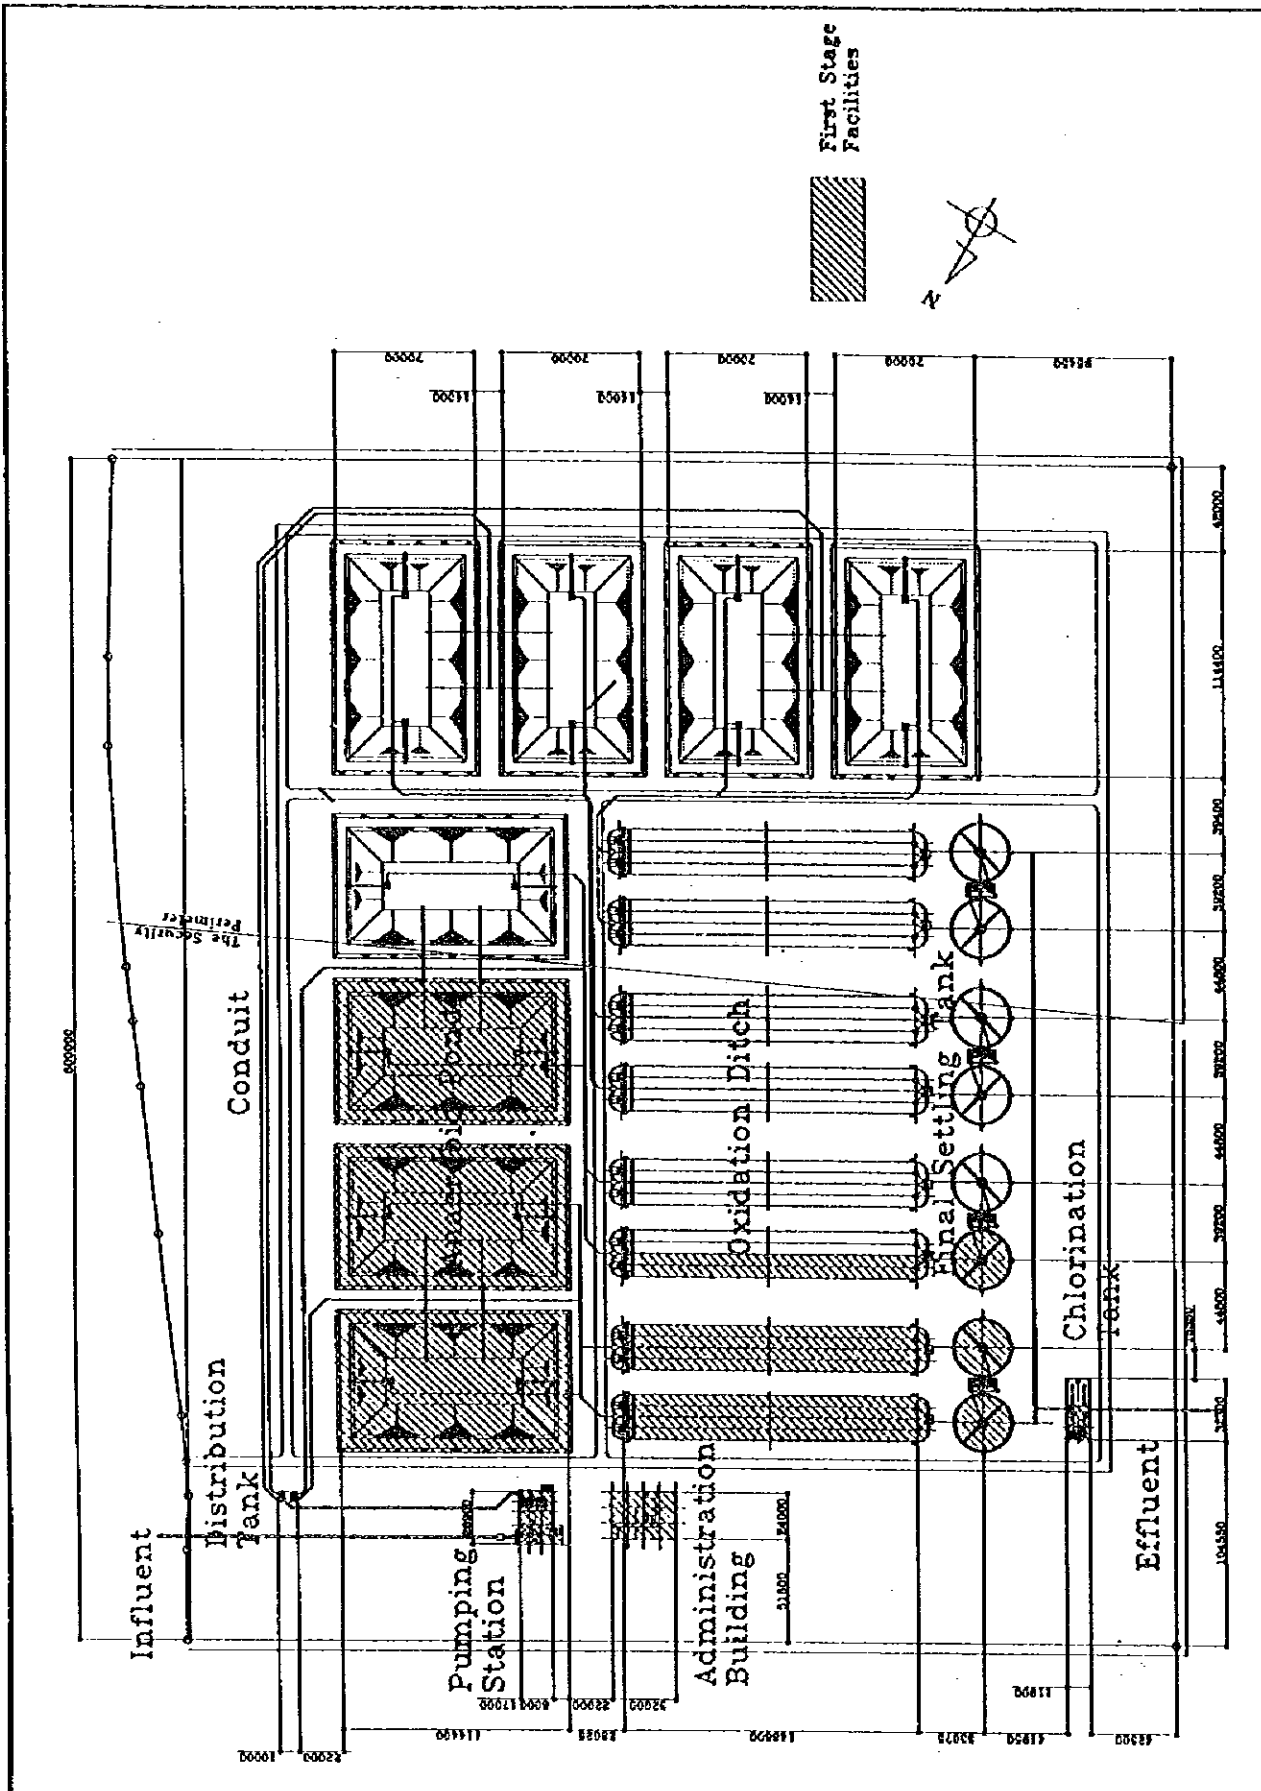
WASTEWATER TREATMENT PLANT LAYOUT
